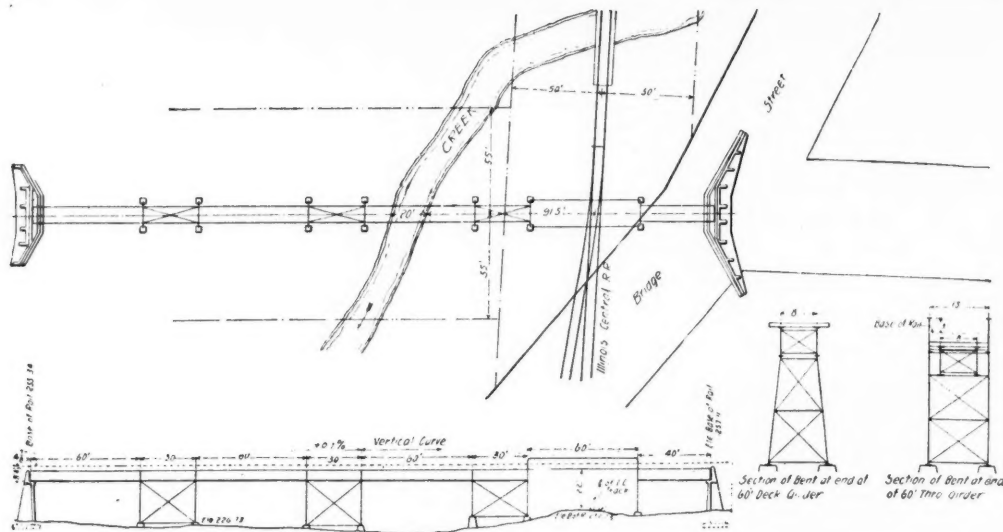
MAP AND GENERAL ELEVATION OF MONTICELLO VIADUCT, WABASH R. R.
